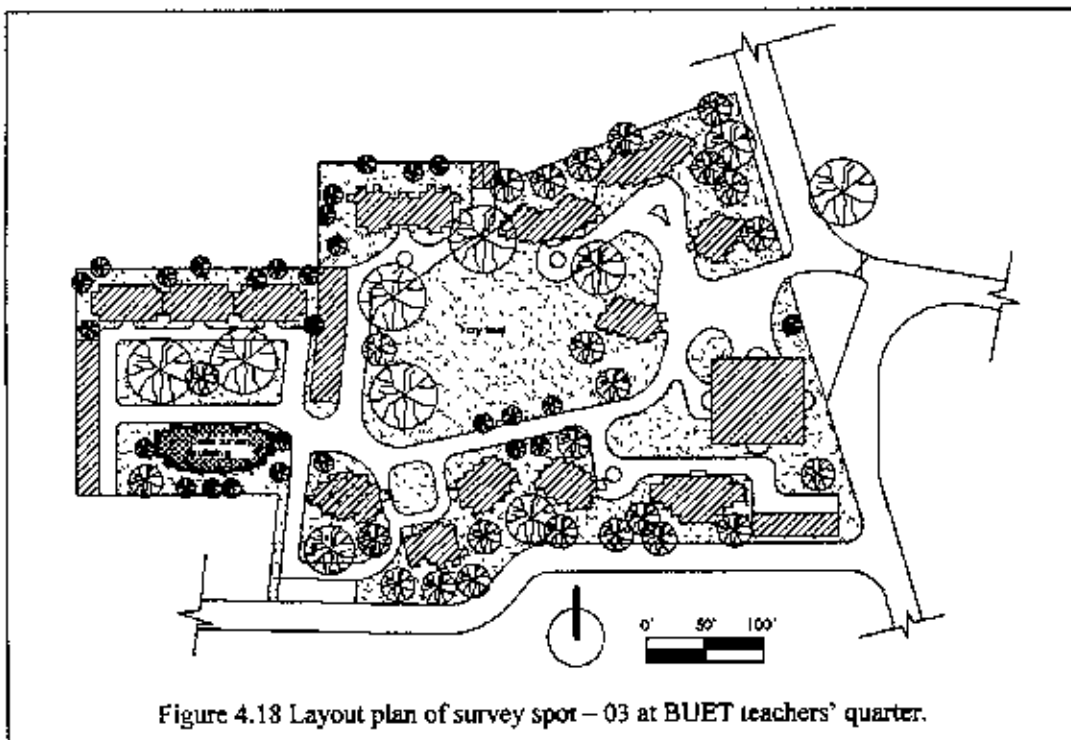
Layout plan of survey spot – 03 at BUET teachers' quarter.
